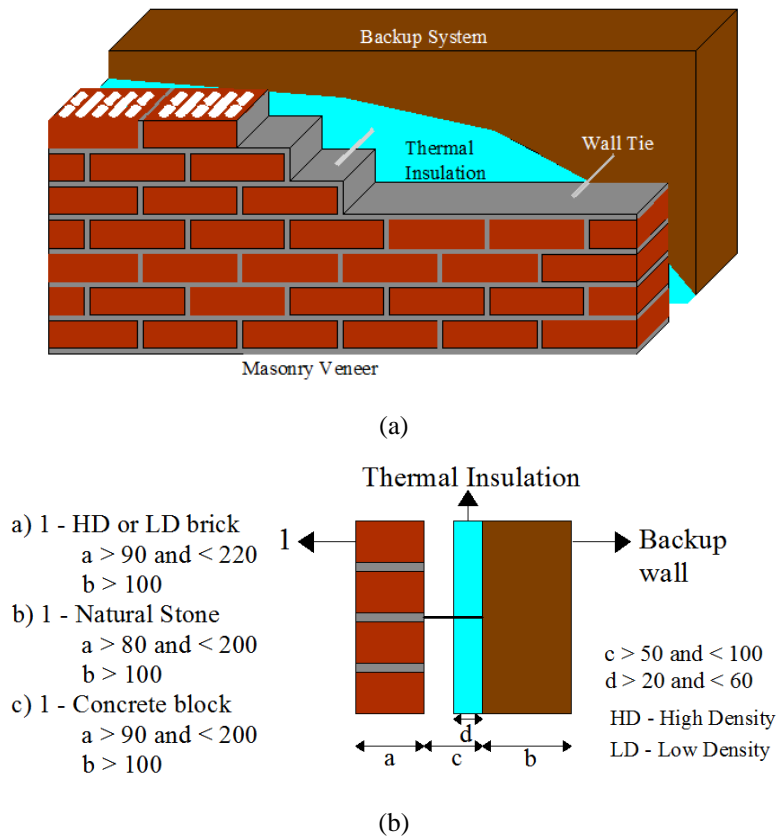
(a) Configuration of veneer wall systems; (b) wall section and configuration (dimension in millimetres) (adapted from French Standard [26])
